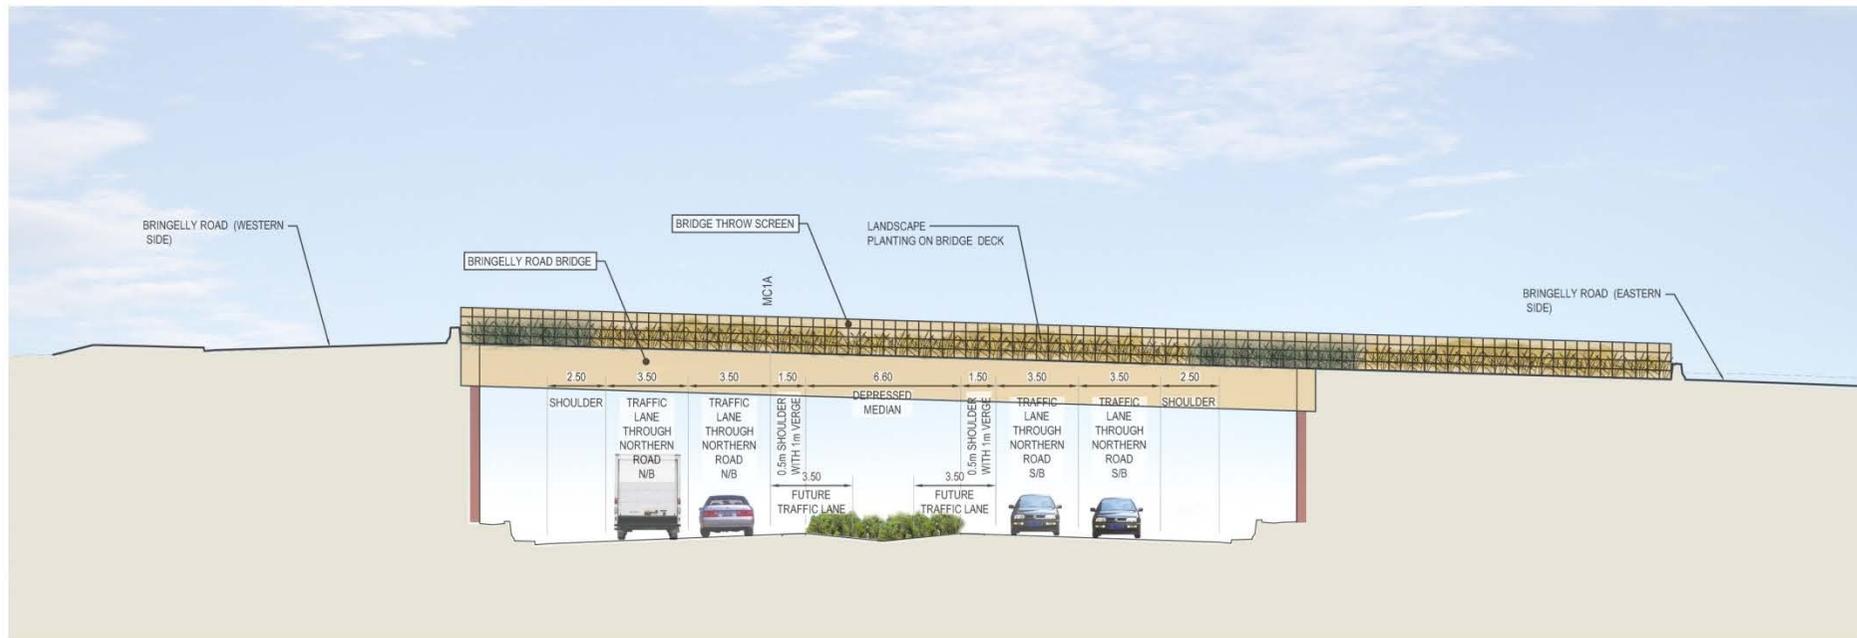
Typical cross section – Bringelly Road / The Northern Road (at the grade separated interchange bridge)
